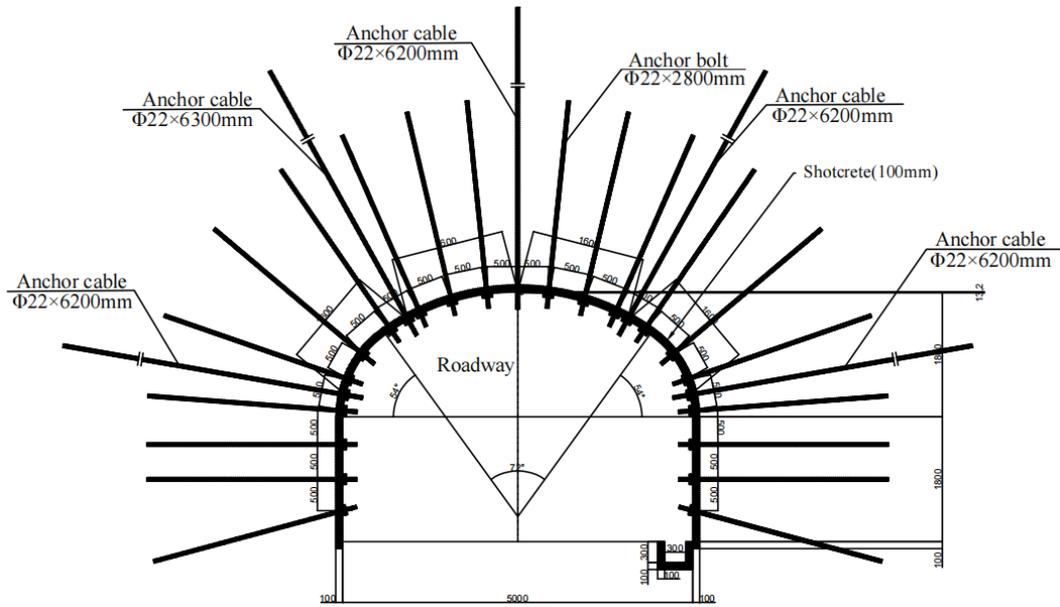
Anchor bolt + anchor cable + anchor net + shotcrete collaborative support section of West wing transport roadway
